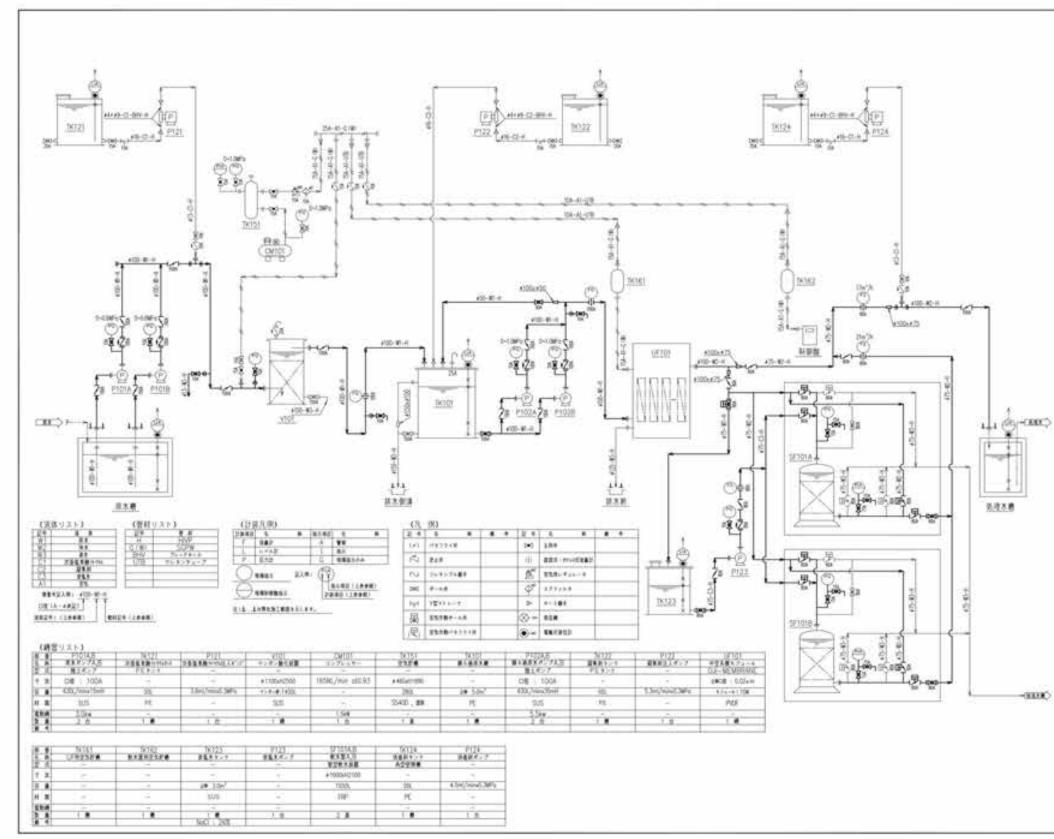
27 OJI Daily Use Water Treatment System Layout Plan
